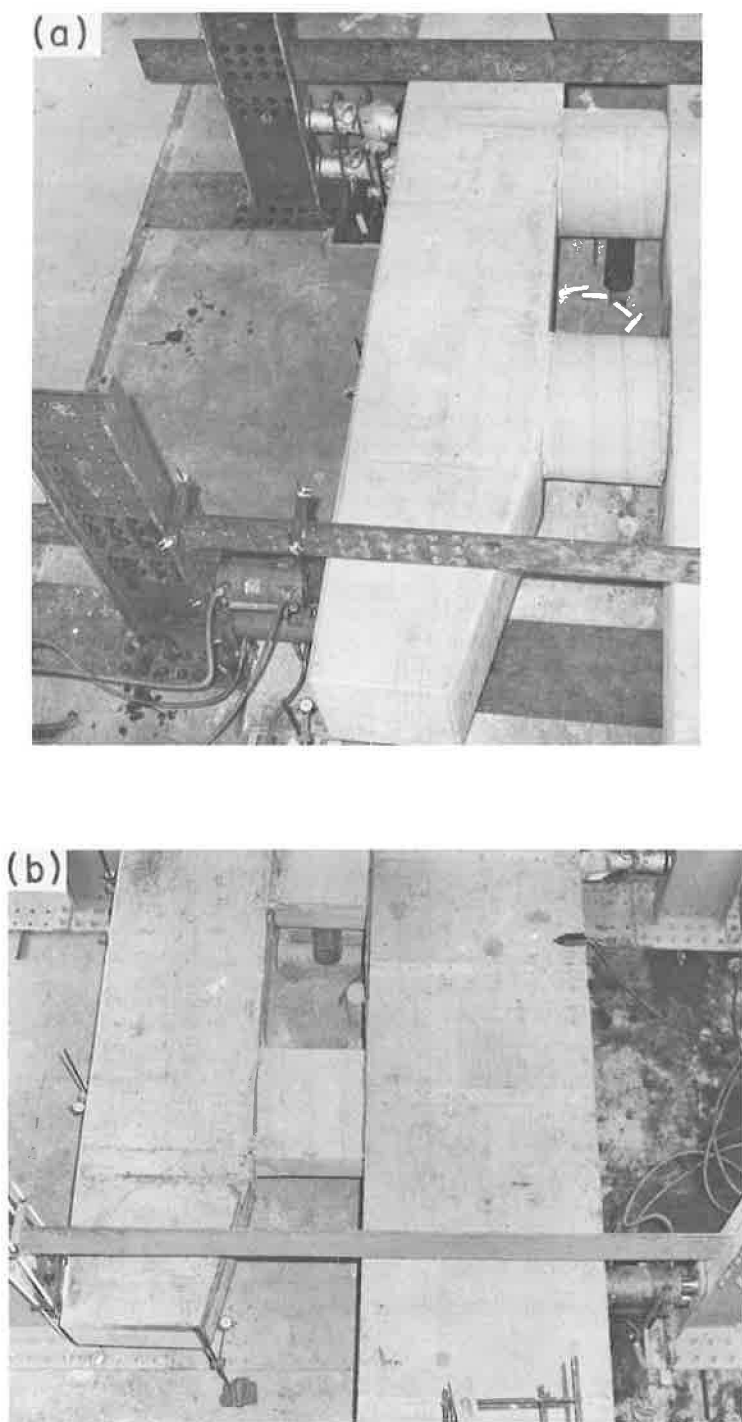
Test setup—load is applied at the near end. The jack position in (b) is the more stable. The load is applied to specimen through a 1-in. square rod between bearing plates in lower left corner.
